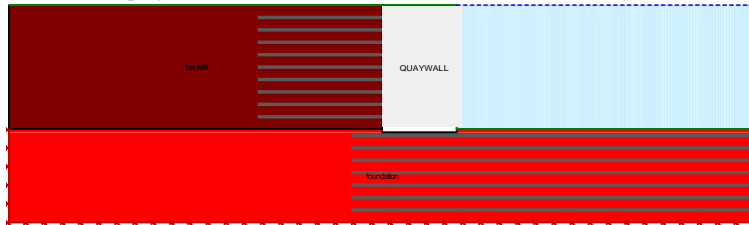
A quay wall model reinforced with both backfill and foundation soils (Case D)
